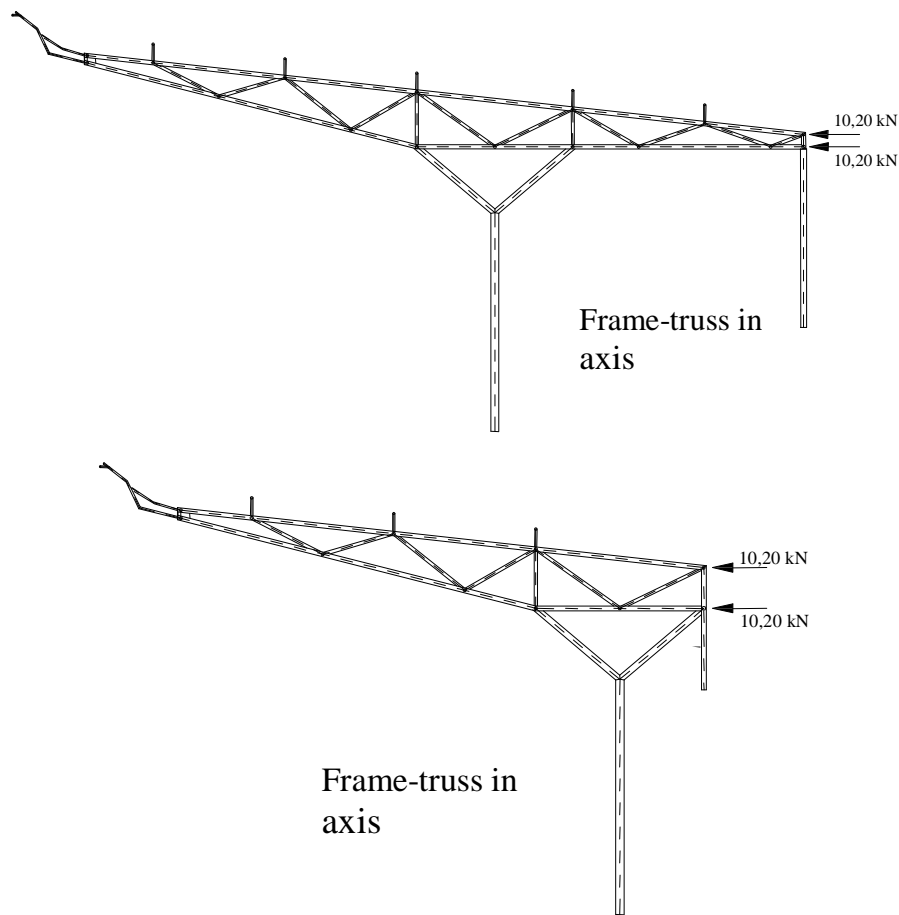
Schemes of horizontal wind actions on the two chosen frame-truss roof structures.
